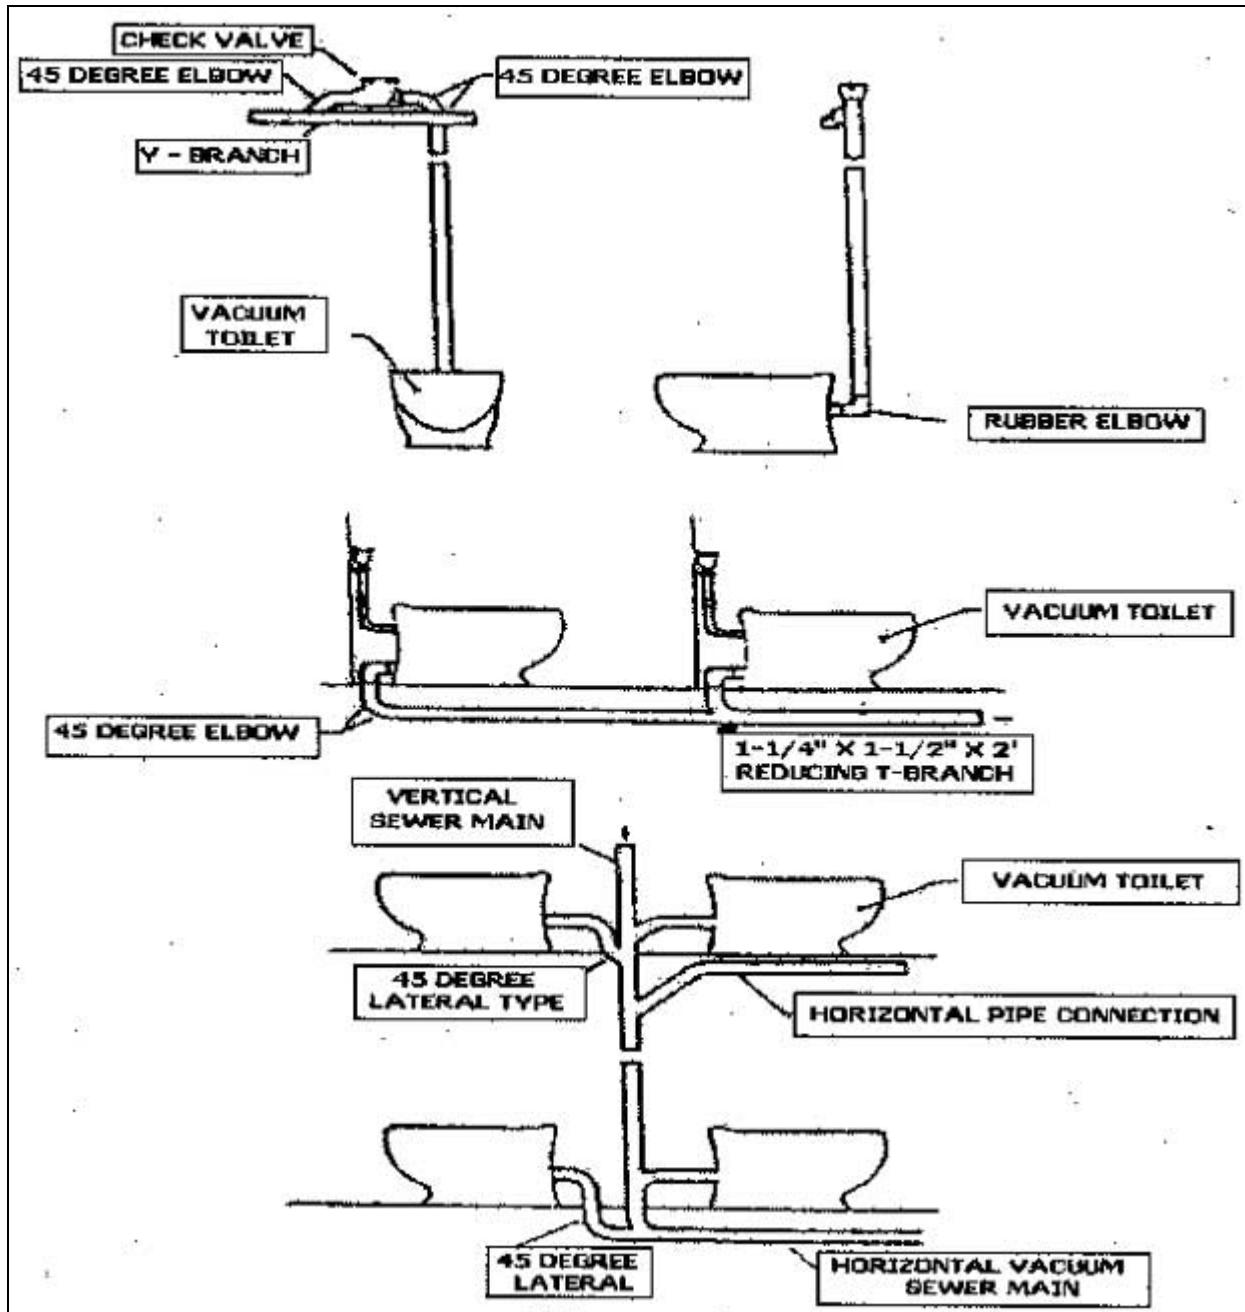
TYPICAL VACUUM FIXTURE INSTALLATION
